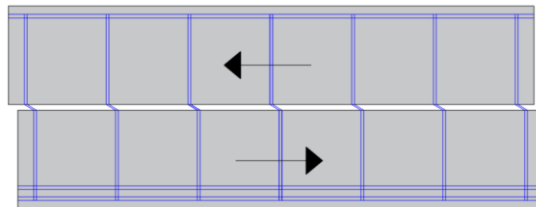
Shear failure mechanism accepted in the early stages of reinforced concrete.
